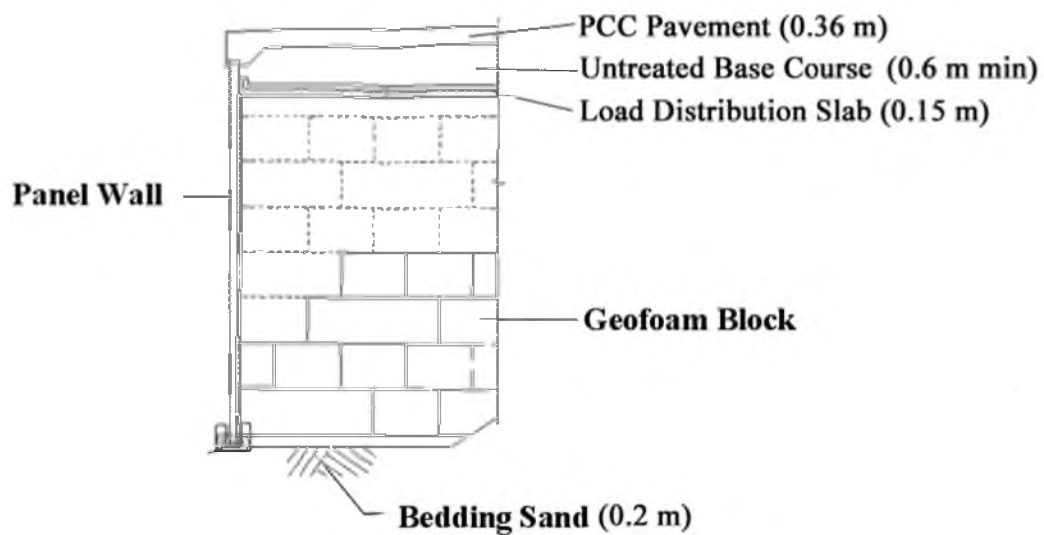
Typical EPS embankment cross-section used for the I-15 Reconstruction Project (after Bartlett and Lawton, 2008)
